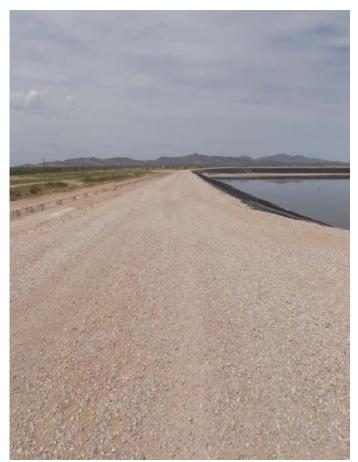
Crest of Evaporation Pond south embankment, looking west.
